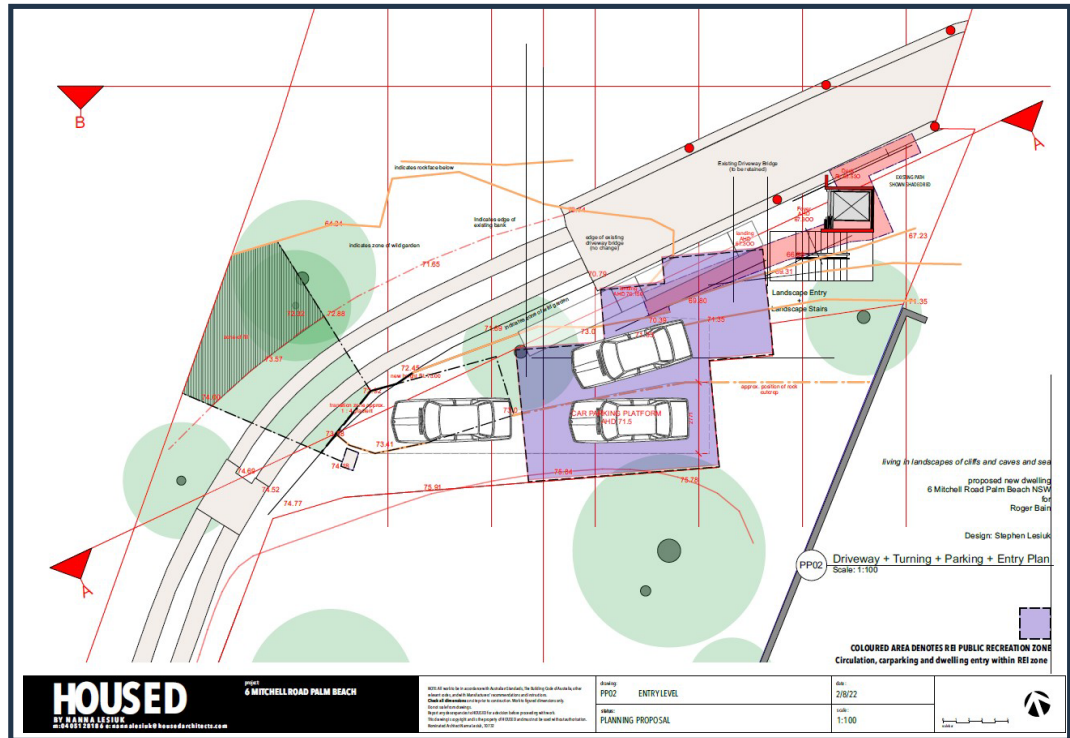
Concept Entry Plan detailing the RE1 zoned land as being utilized for vehicular access and garage (Source: Housed Architects)
